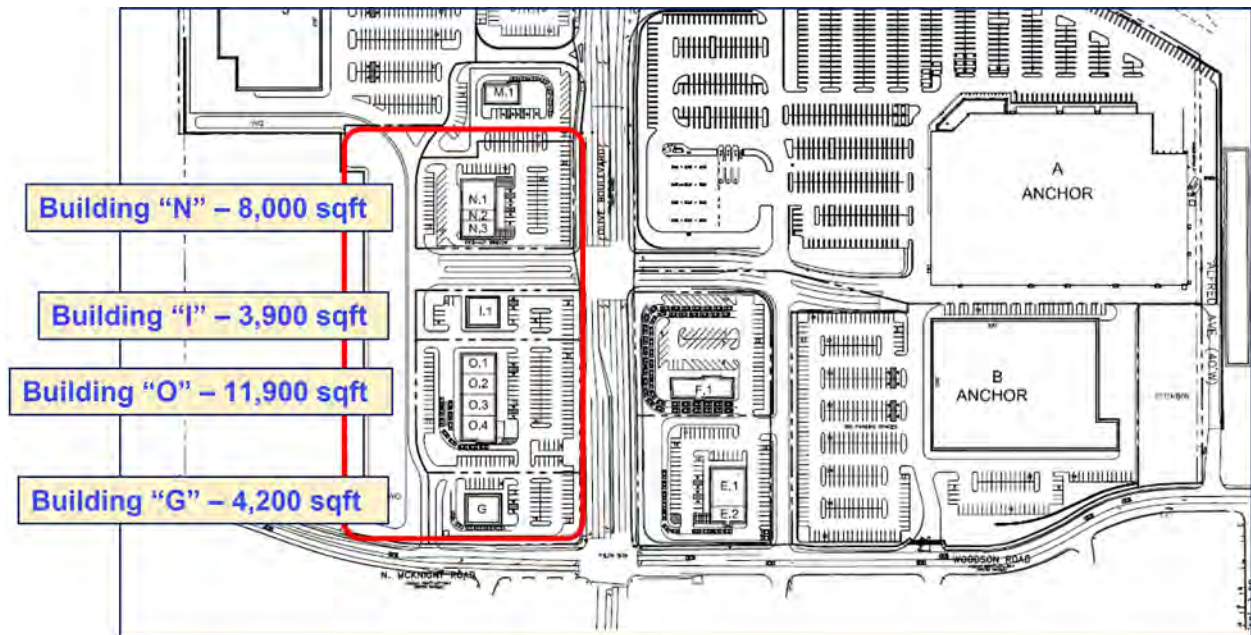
Proposed building sizes for development at the southwest corner of Olive Boulevard and McKnight Road.
